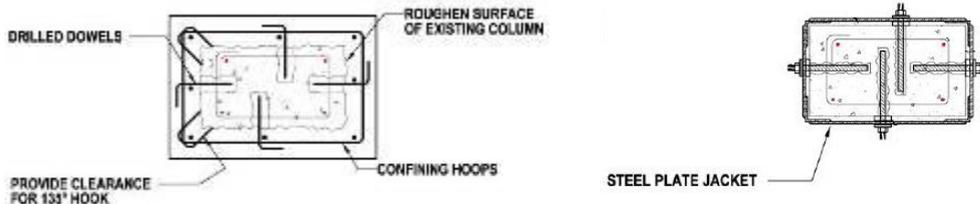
Concrete jacket (left) and steel jacket (right) [1].
